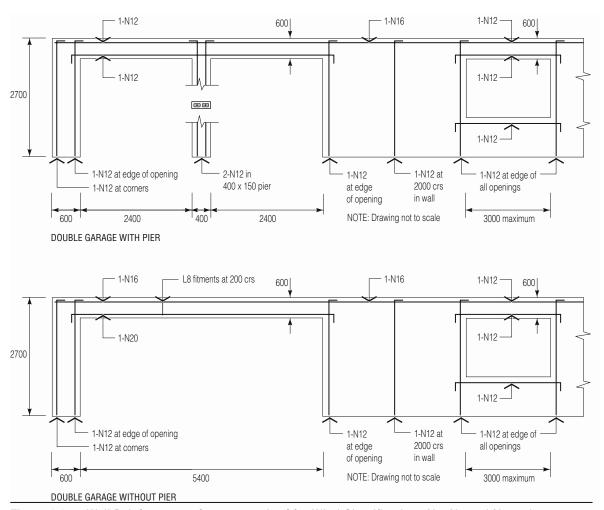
Wall Reinforcement for 140-mm Leaf for Wind Classifications N1, N2 and N3 and 2700-mm Wall Height
